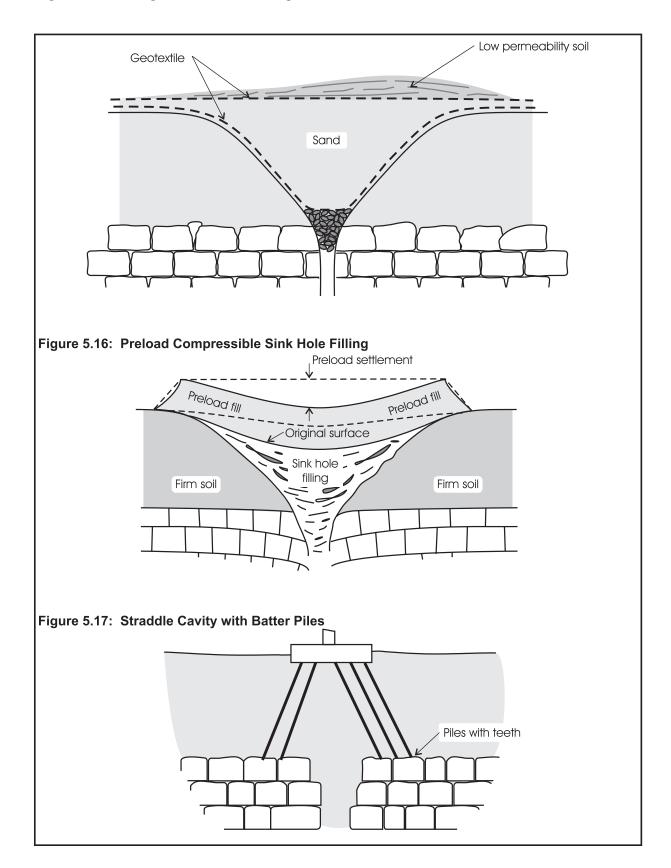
Filling Sink with Stone Plug, Geotextile and Sand
